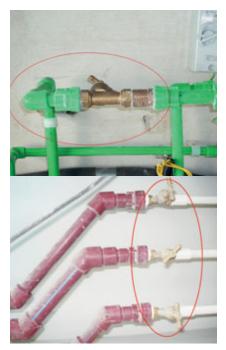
Possible to connect with dissimilar materials by flanges or adapters.
